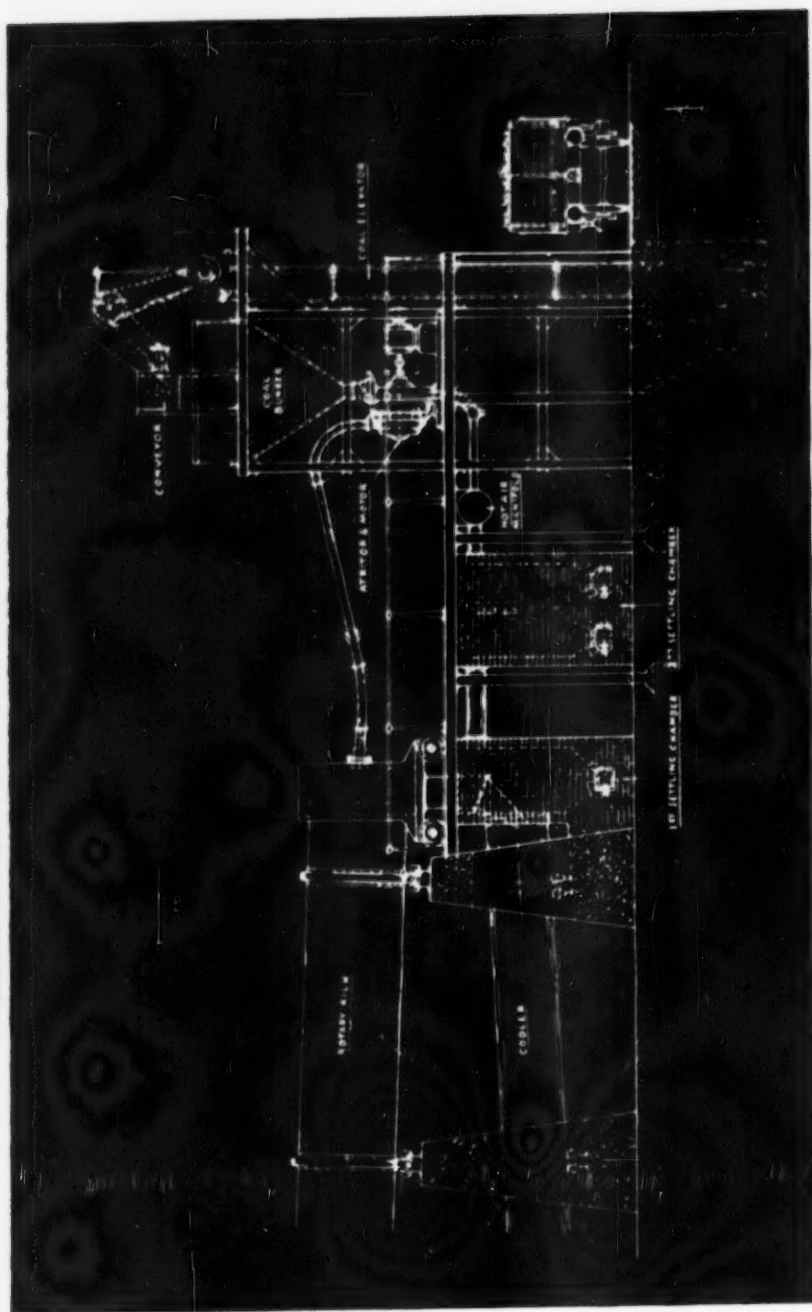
Sectional view showing No. 16 Atritor firing a rotary cement kiln
